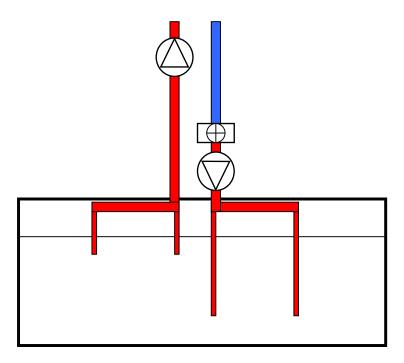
Low-rise building with supply and exhaust ventilation before renovation.
